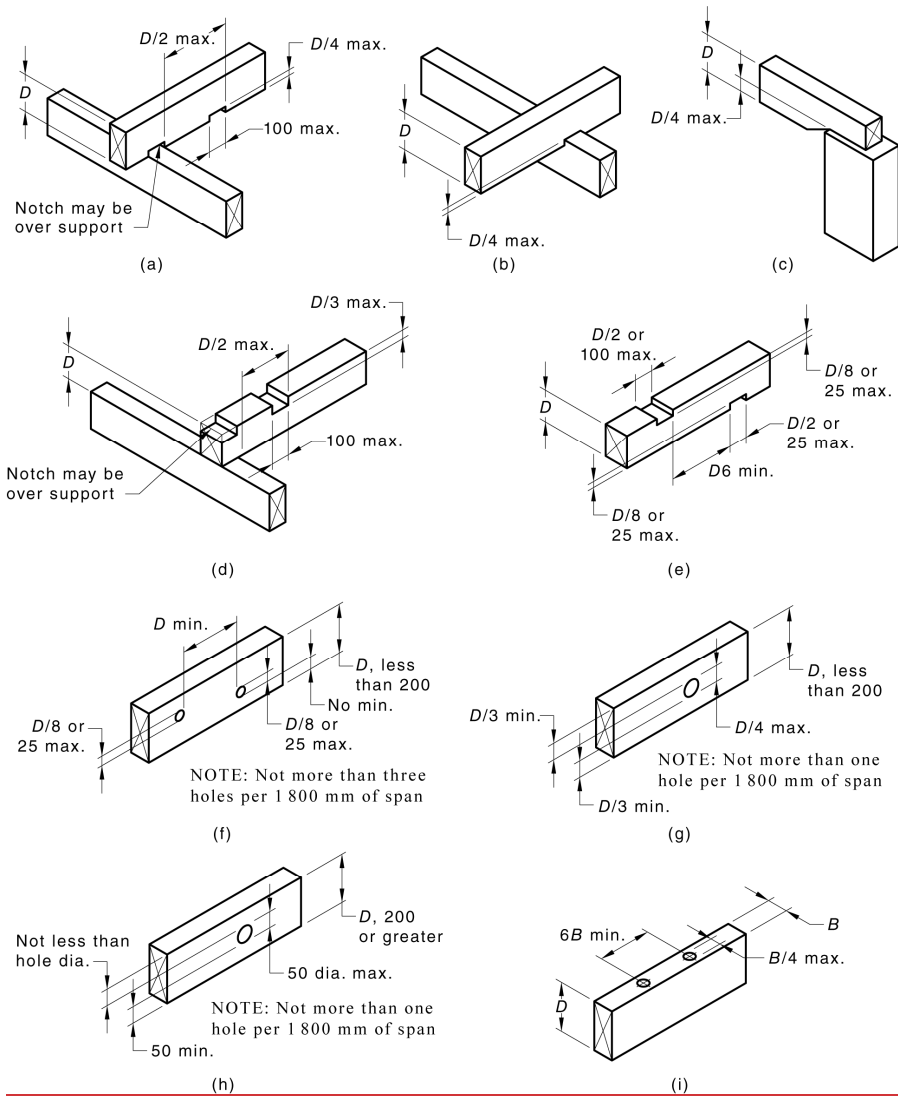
(B) — Notches, cuts and holes in beams, bearers, joists, and rafters
